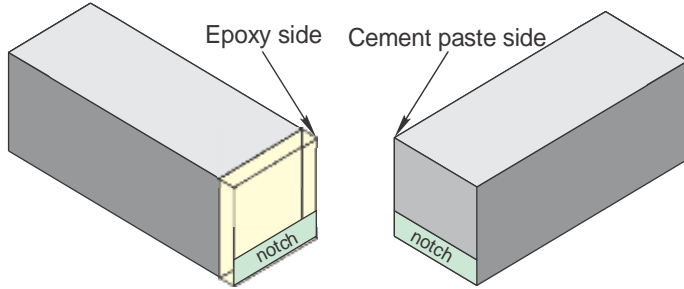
Failed beam specimen. Fracture surfaces on both epoxy and cement paste side of each specimen were examined.
